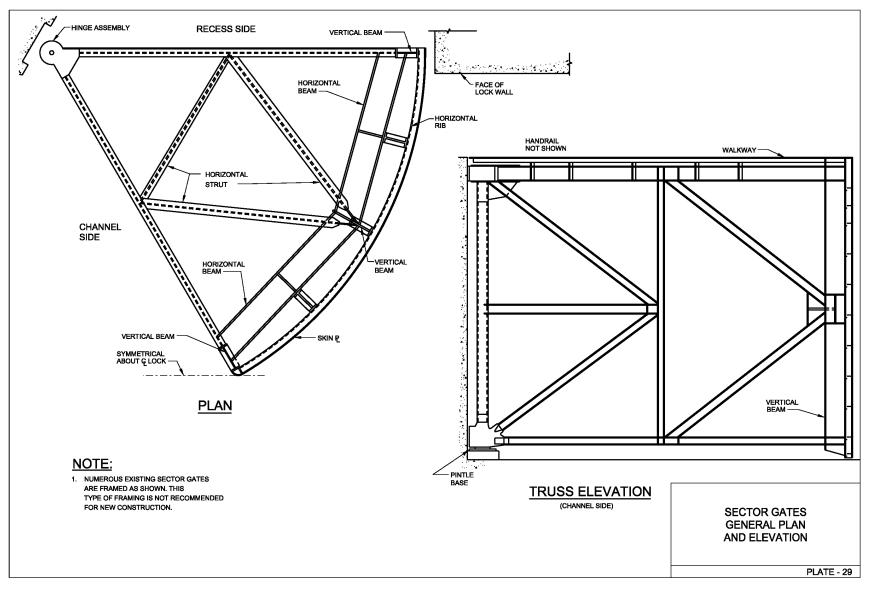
Plate 29: Sector gates, general plan, and elevation
